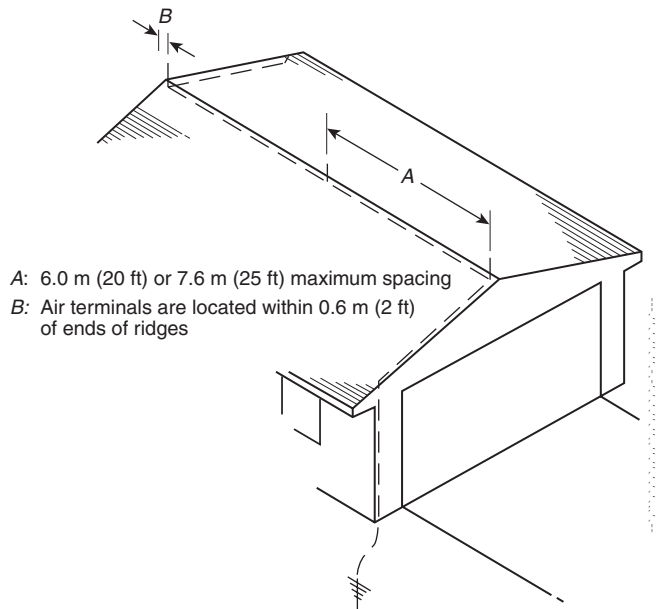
Air Terminals on a Pitched Roof.
